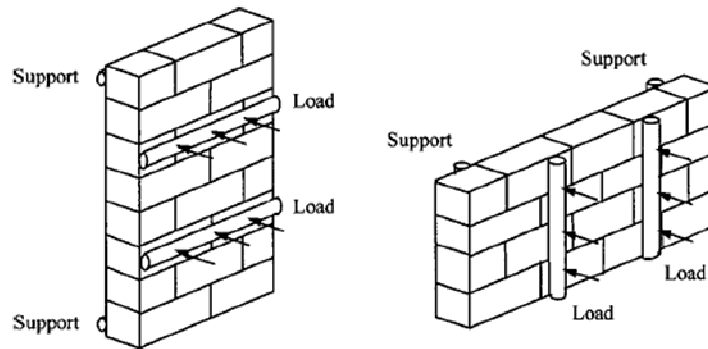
Testing arrangement of wallettes (BS 5628) : (a) plane of failure parallel to bed joint; (b) plane of failure normal to bed joint
